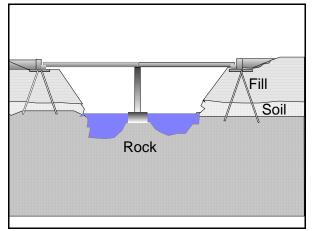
Two-span bridge with the pier located on rock and the abutments located on point-bearing piles resting on rock.
